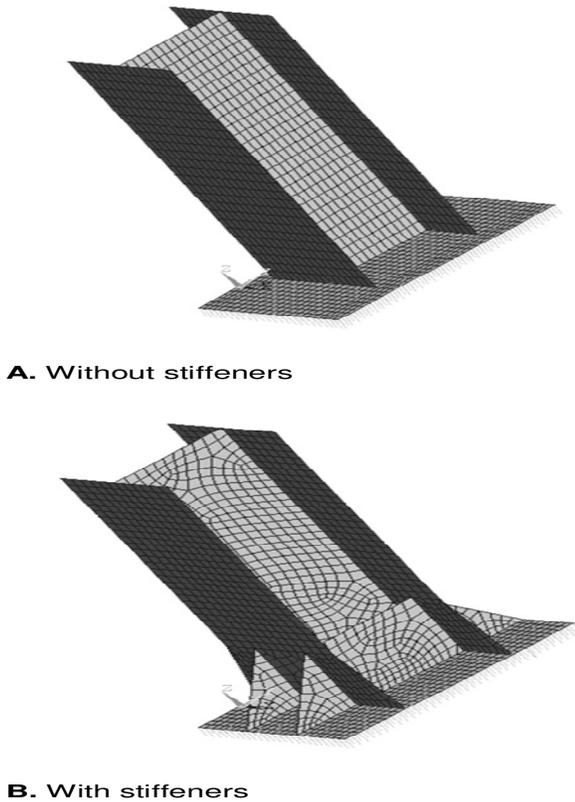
Analytical models of column base plate without and with stiffeners (axial force and moment).
